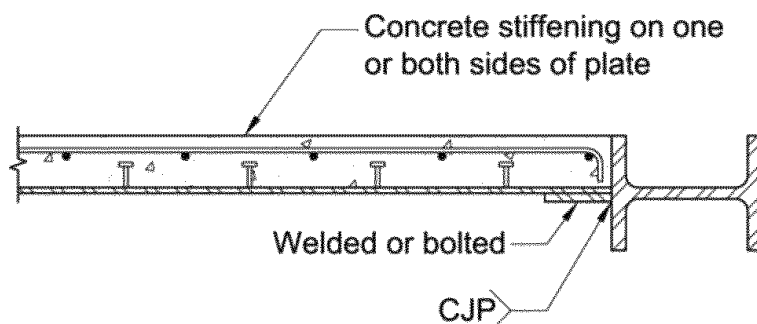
Concrete stiffened steel shear wall with steel boundary member.
